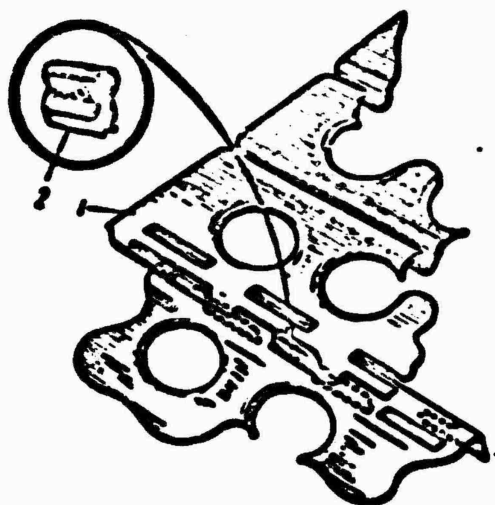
Details of an attachment for pierced planks. 1) Prefabricated pavement; 2) spring lock.
